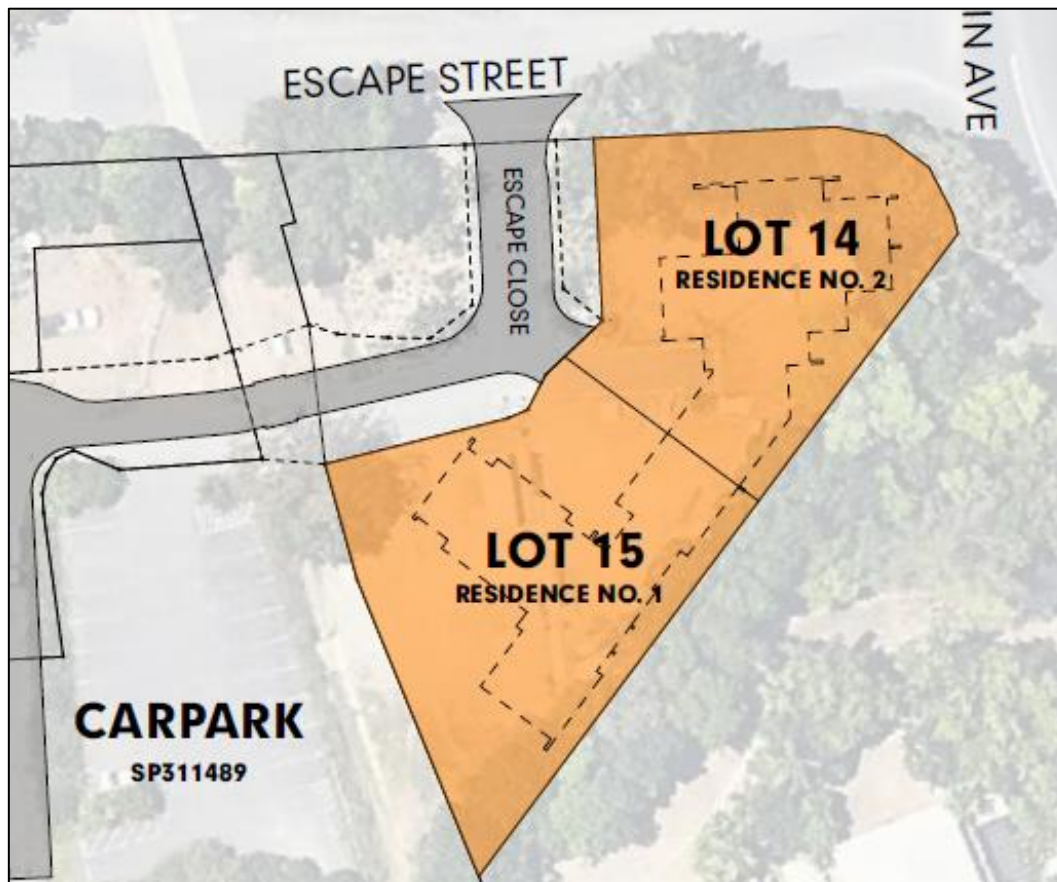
approved lots – shown as a cadastral plan over air photo
